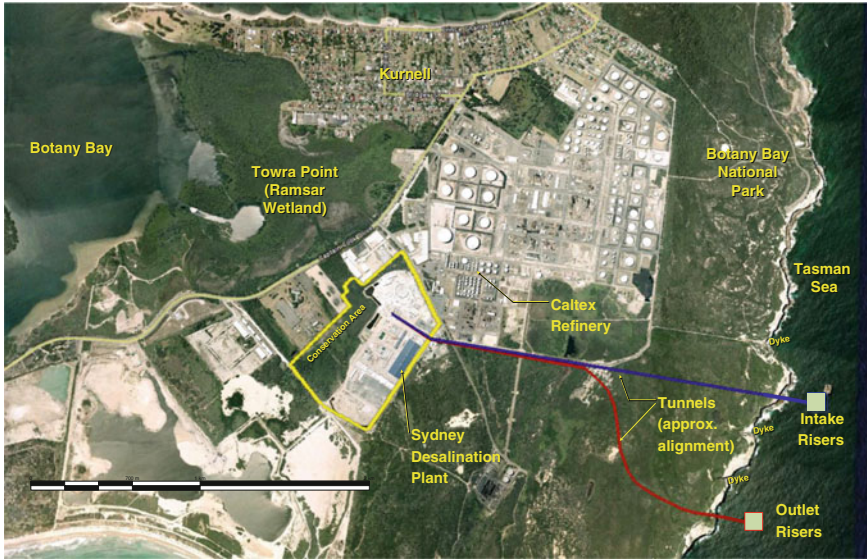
Tunnel and marine structures location—Sydney desalination plant
